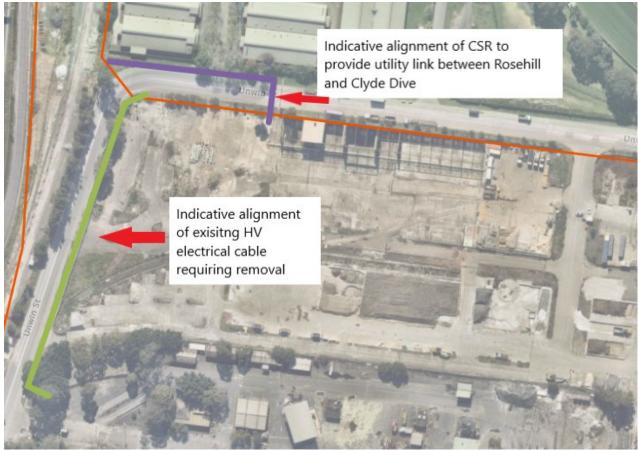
Utility works along Unwin Street near Clyde Construction Site
